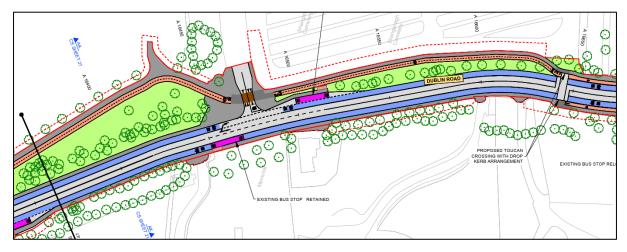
Extract from General Arrangement Drawing at Shanganagh Park/ Cemetery (Sheet 47)
